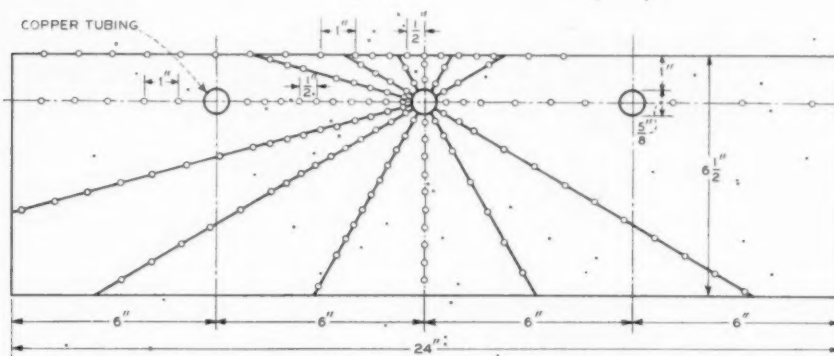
THERMOCOUPLE ARRANGEMENT AT CENTER CROSS SECTION OF SLAB
